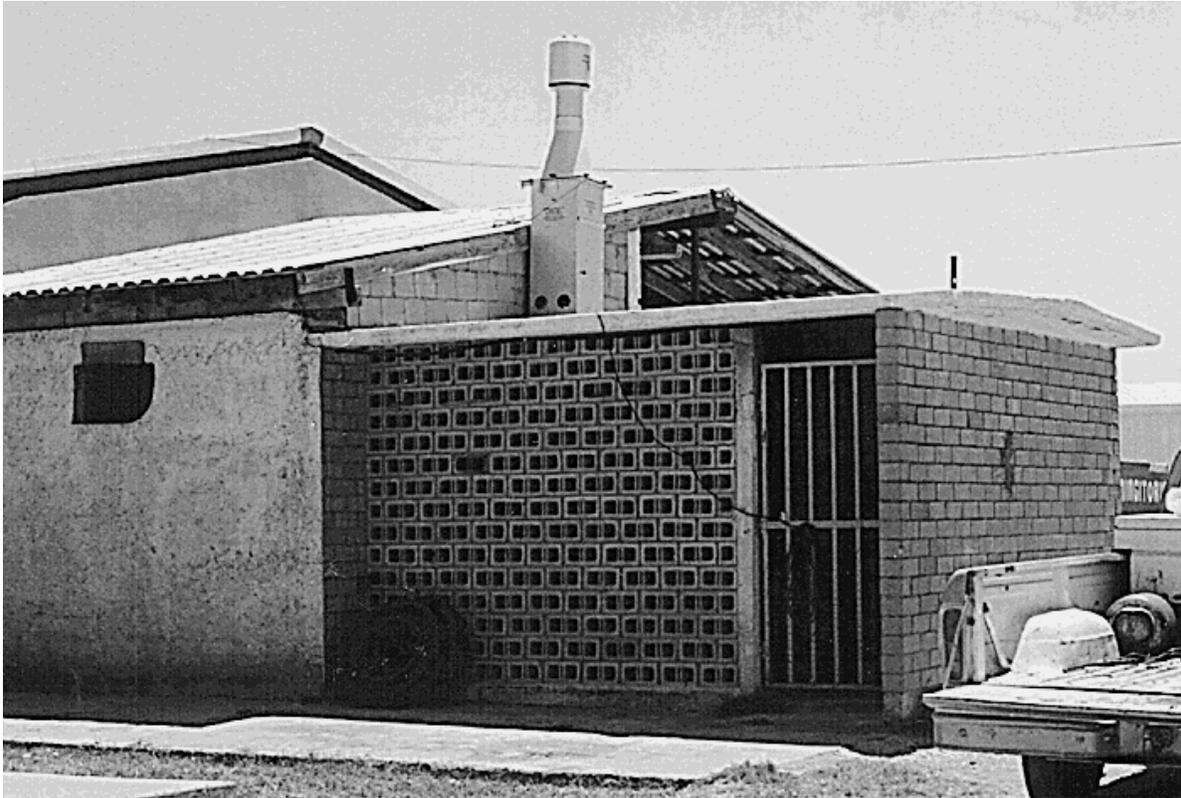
Location of Station No. 4 on one-story top building at Conalep Technical School, Piedras Negras.
